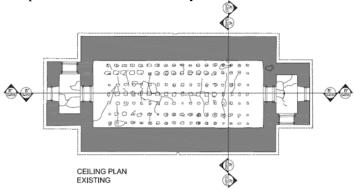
Ceiling Plan of Barood Khana (Source: WCLA)
